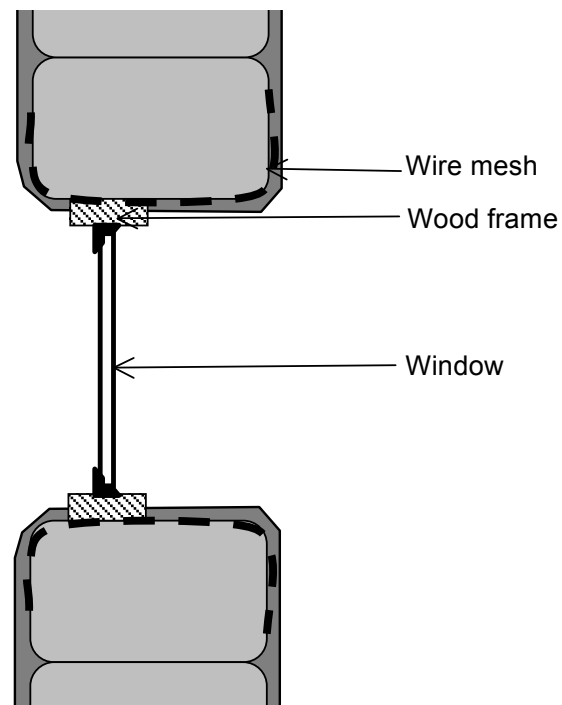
Detail of a typical window opening in a straw bale wall.
